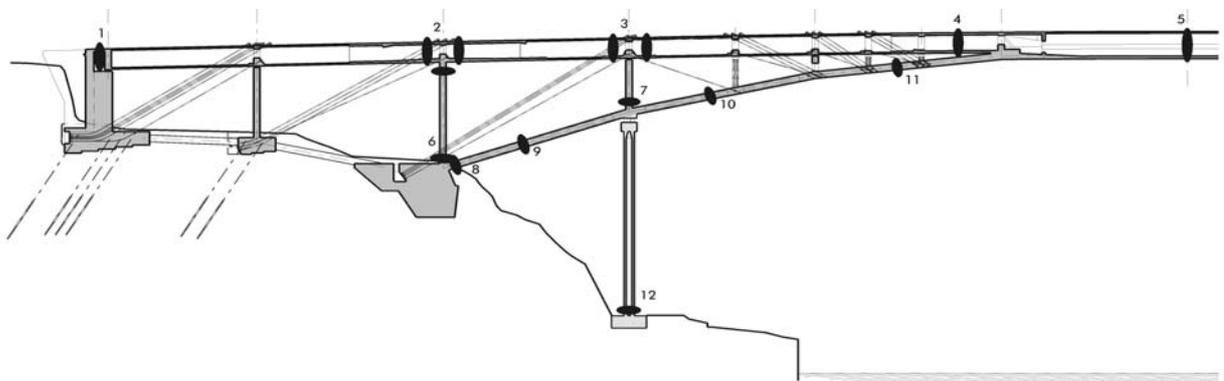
Location of the sections containing instrumentation in the Gaia half bridge
